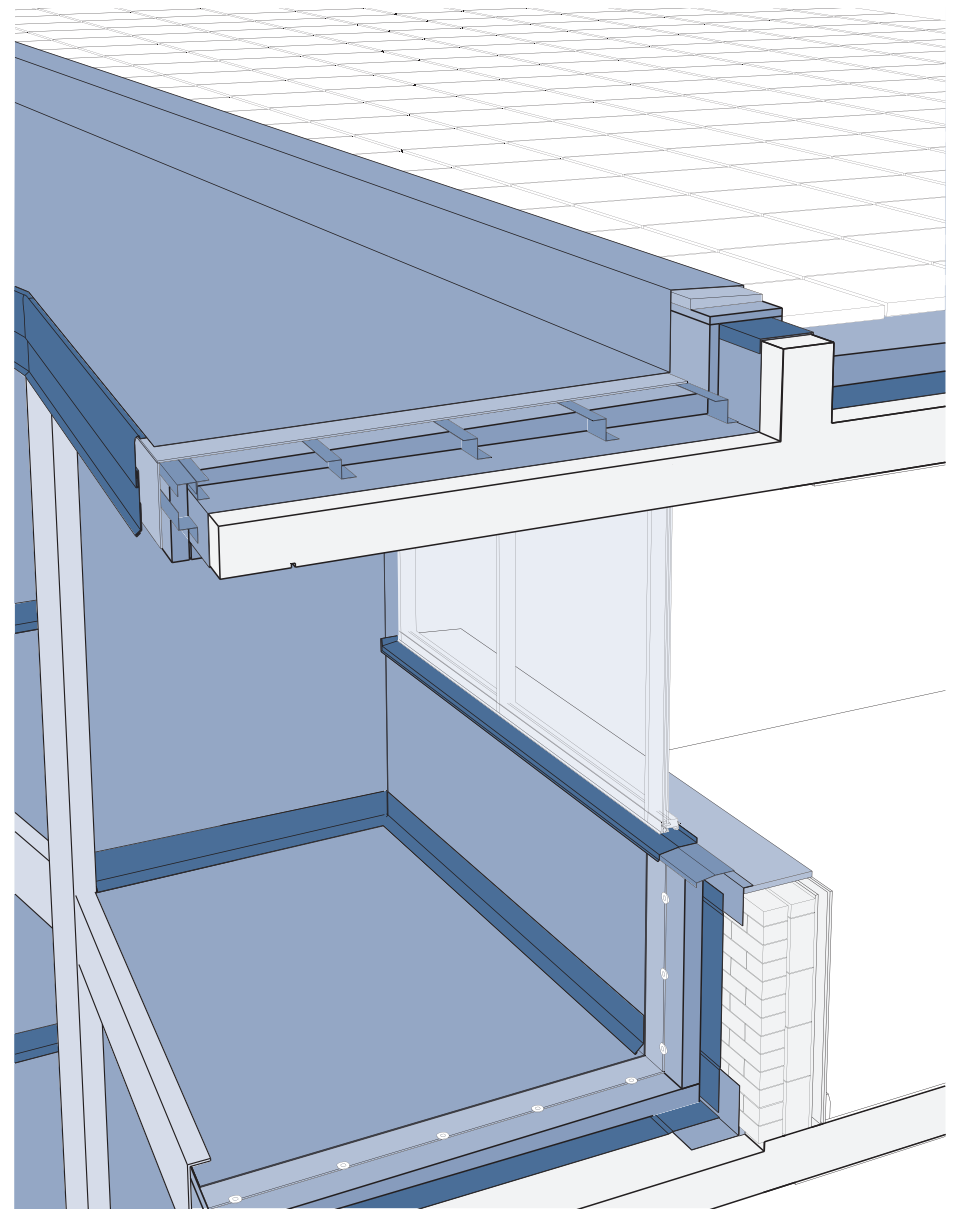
Flashings are installed at the projecting roof slab edge. A roofing membrane is laid over the projecting roof area and lapped over the parapet and the flashing. Pavers are laid on top of the spacers in the main roof area.
